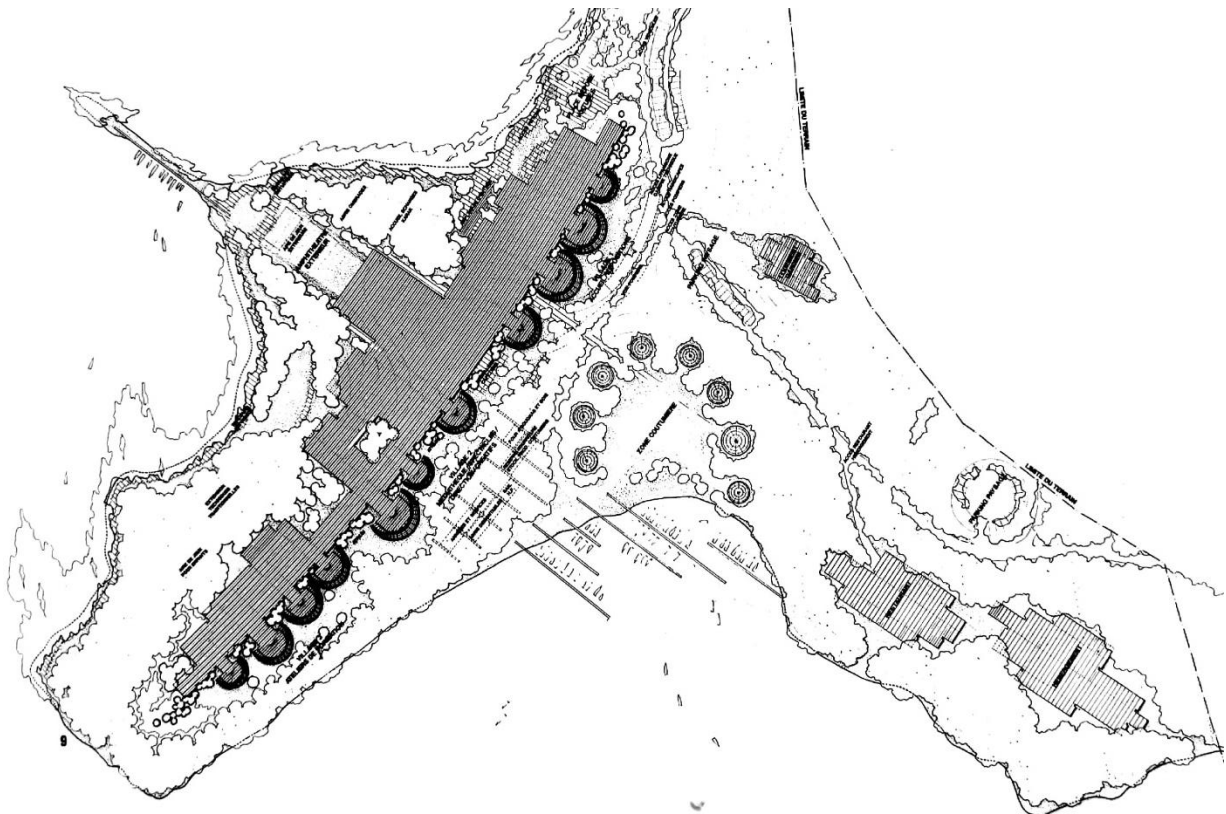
23: Roof plan (Source: Buchanan, 1995: 205)
